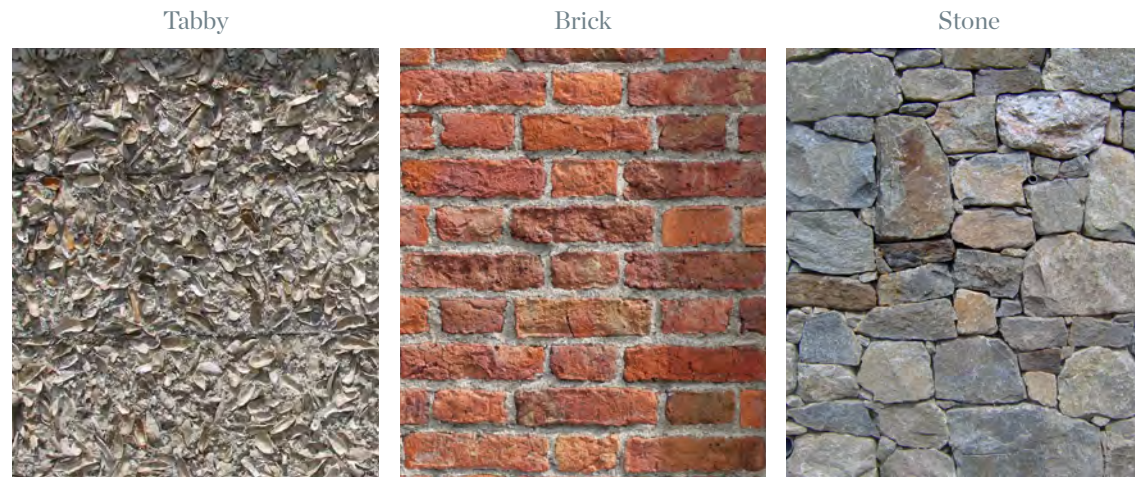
RETAINING WALL MATERIALS
